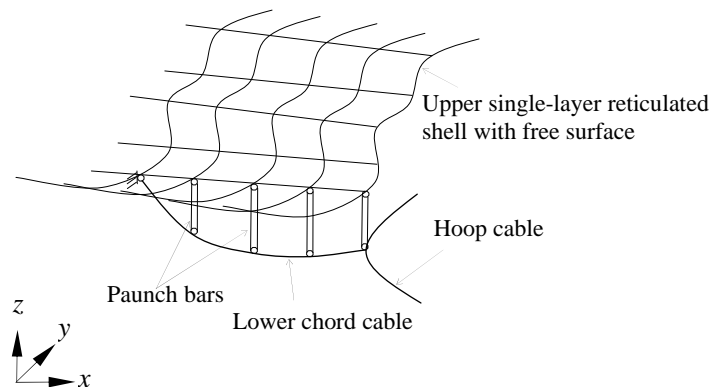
Suspended Single-layer Reticulated Shell with Free Surface
